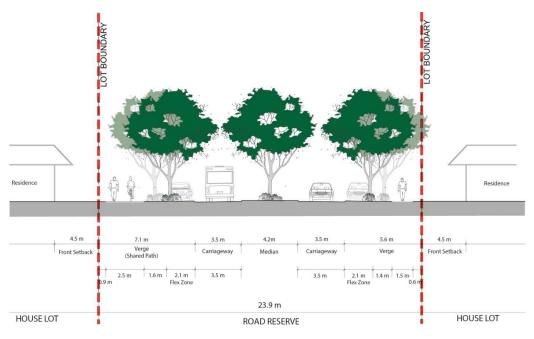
Collector Road Cross Section – Median (Flex Zone)
